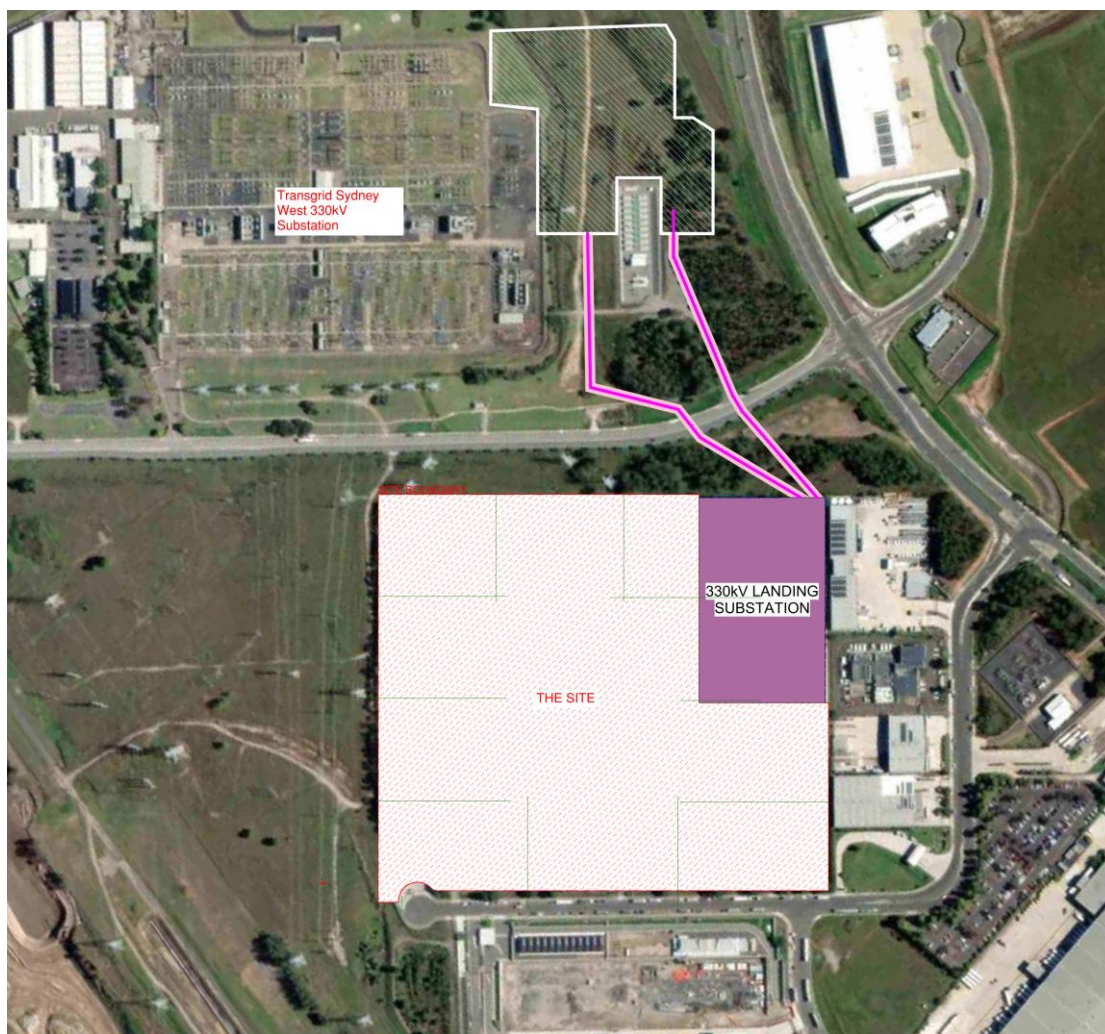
Site Plan (Source: Grimshaw Architects)
